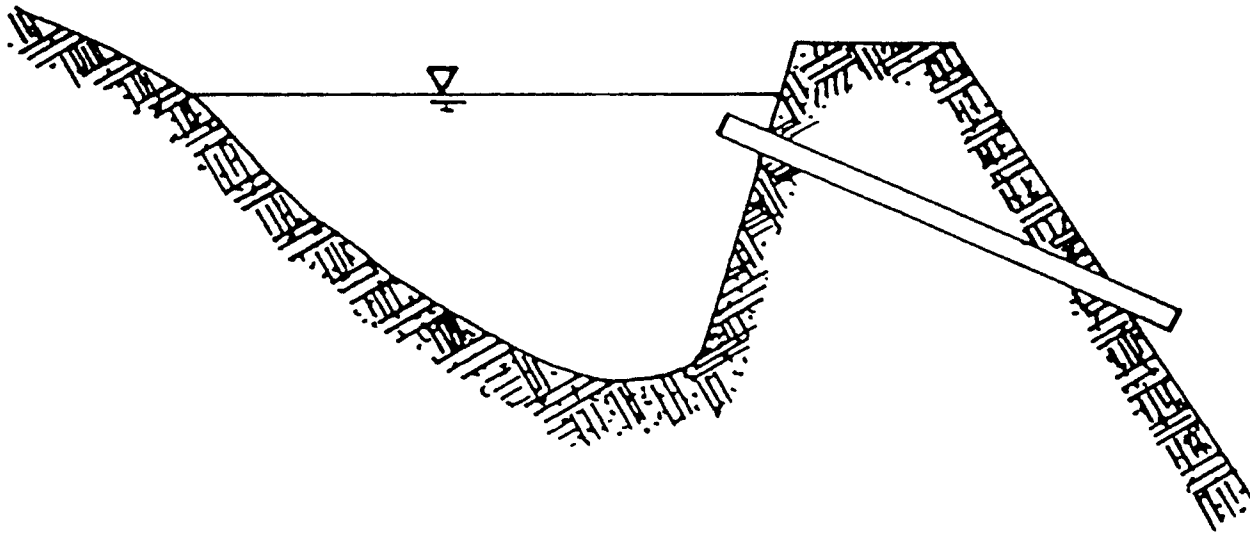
Culvert used as an outlet to a farm pond (Barfield et al., 1981).
